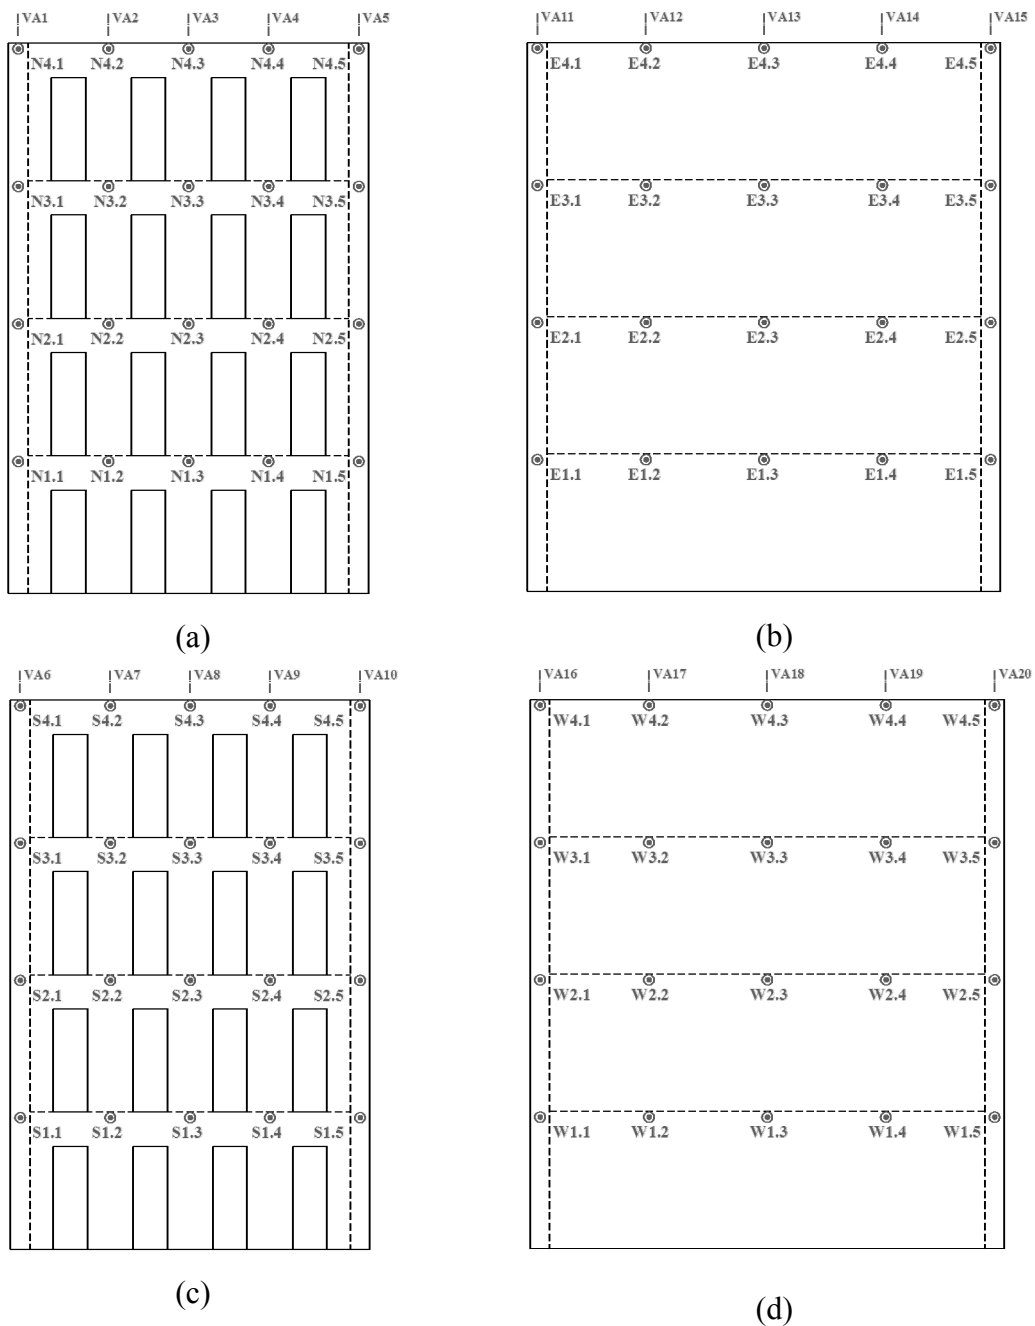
Accelerometers setup: (a) North facade; (b) East gable wall; (c) South facade; (d) West gable wall.
